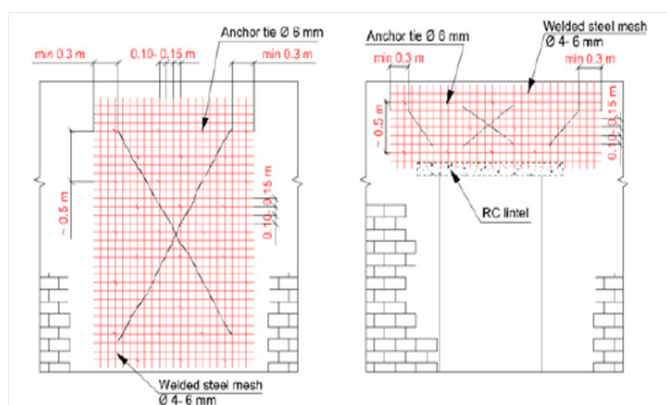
Repair cracked brick masonry wall with reinforced concrete coating
